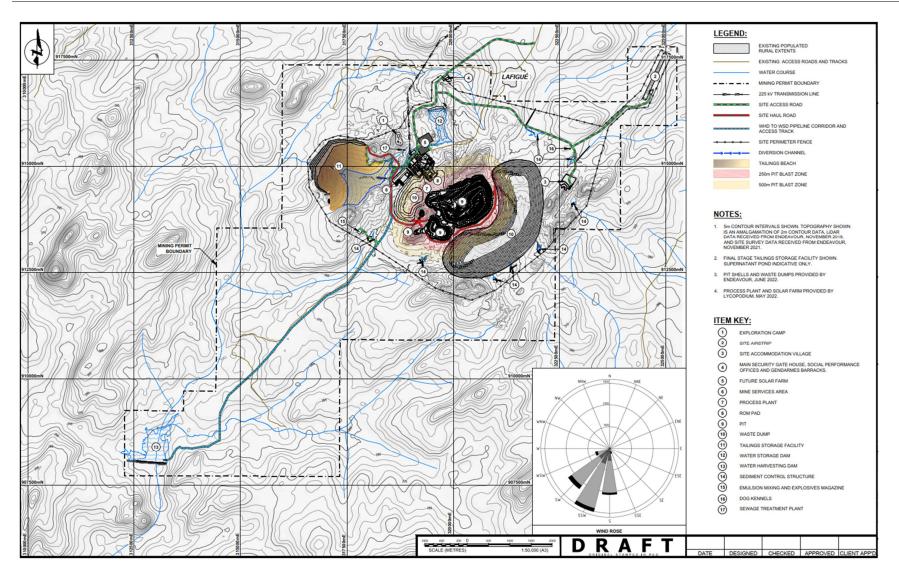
PE 58 License and Project Layout (KP, 2022b)
